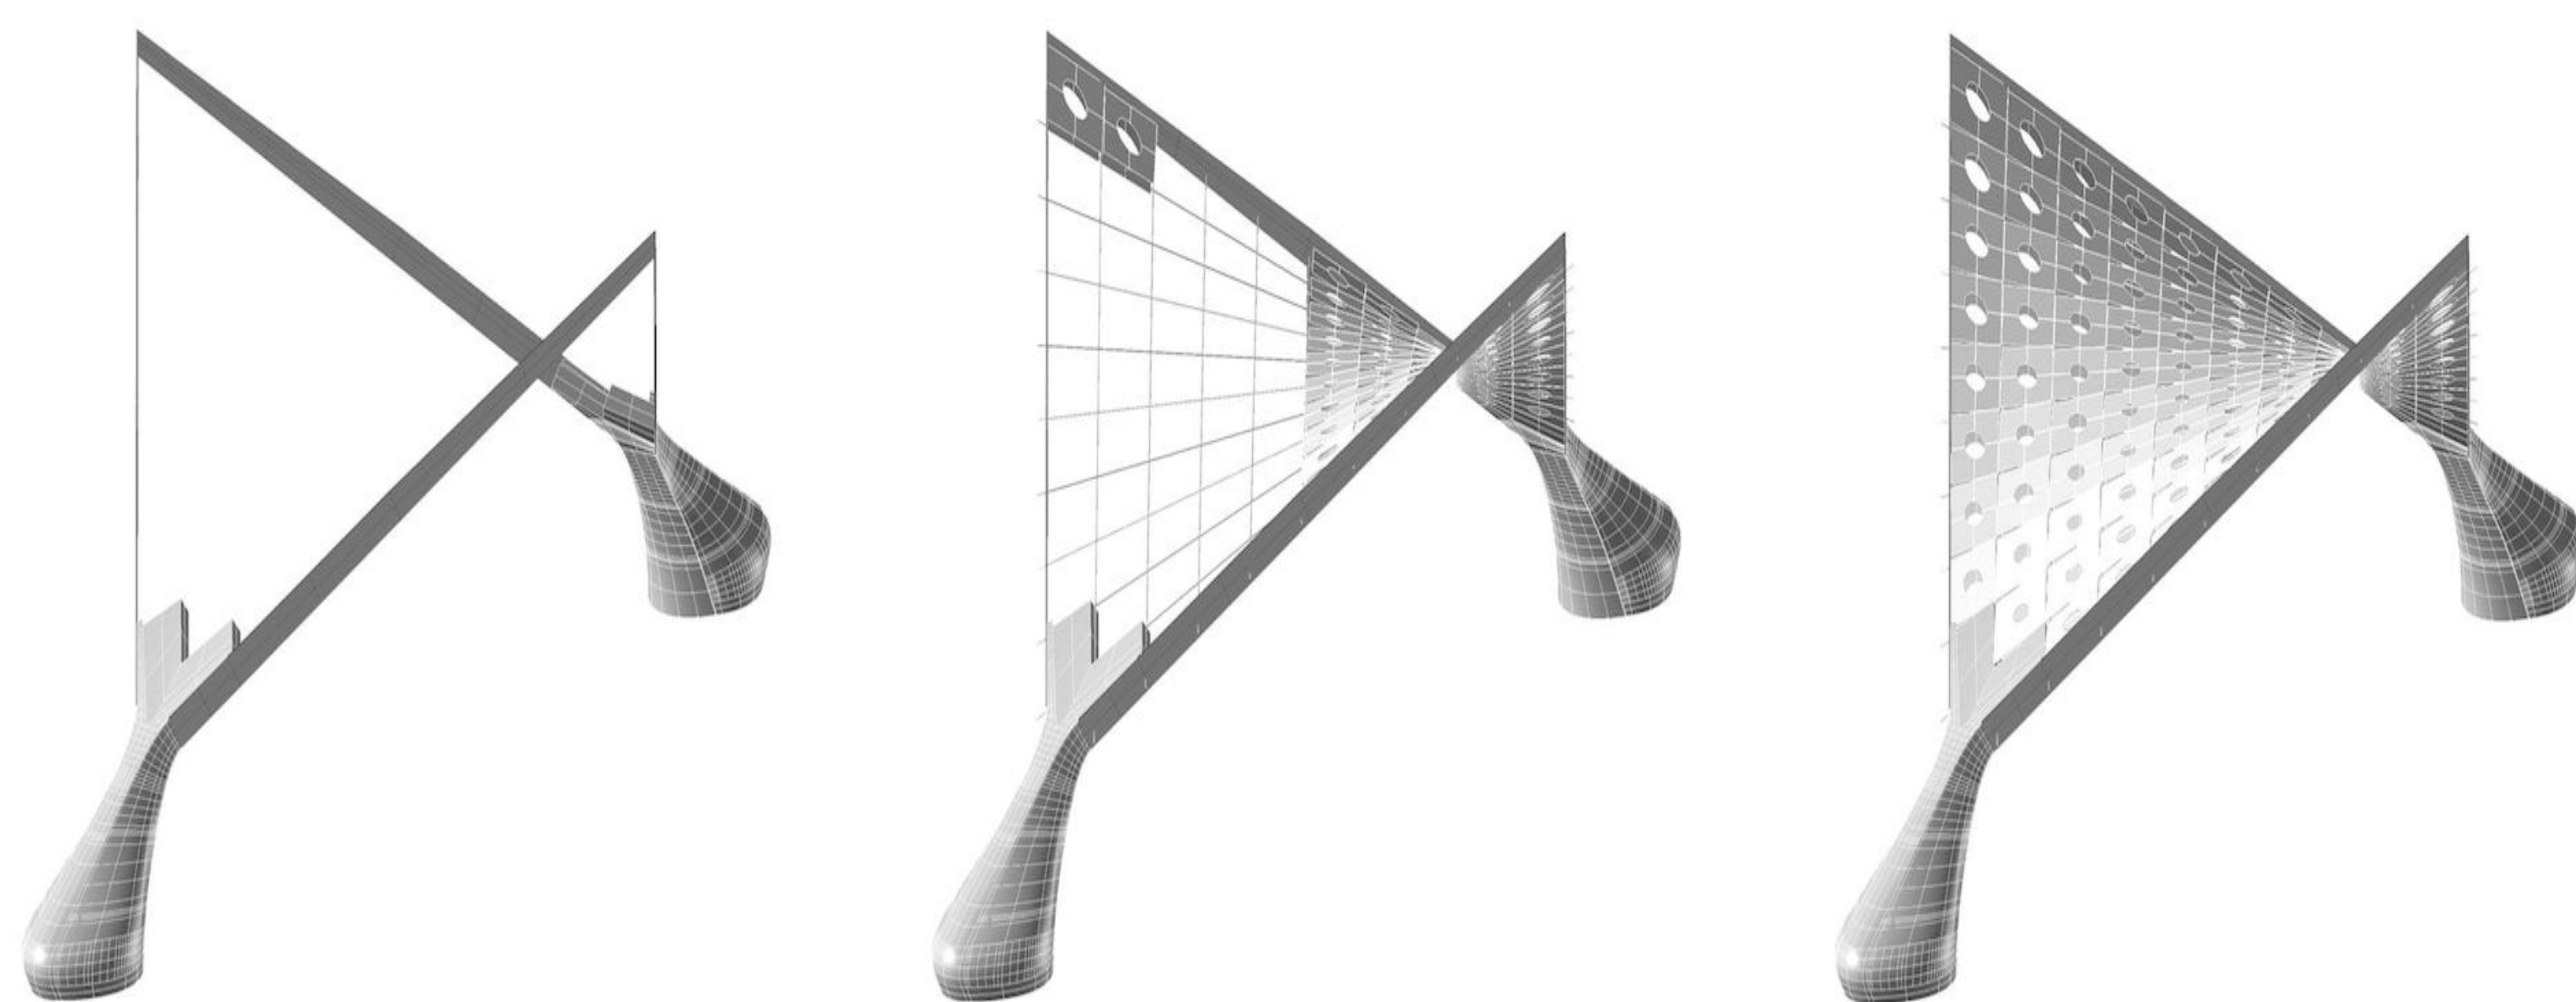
Main steps of construction: edge steel beams, pre-stress steel cables and stone ashlars
